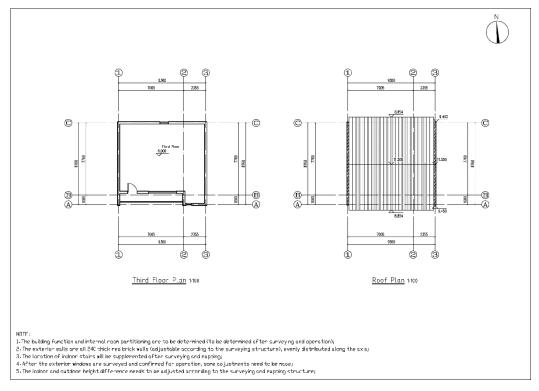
The Third Floor Plan and Roof Plan of Sample Building No. 2 (Drawn by the author)
